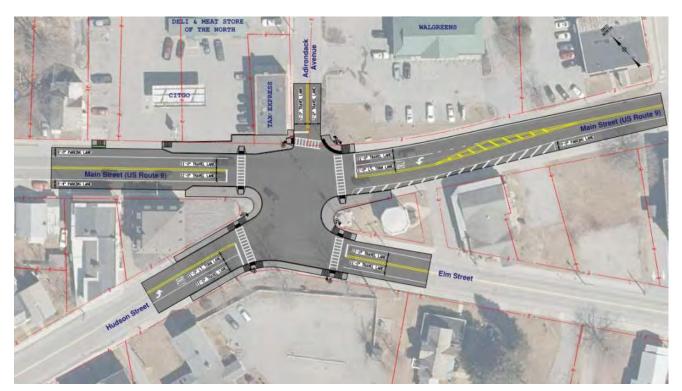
Main Street (US Route 9) / Adirondack Avenue / Elm Street / Hudson Street Intersection Improvements
